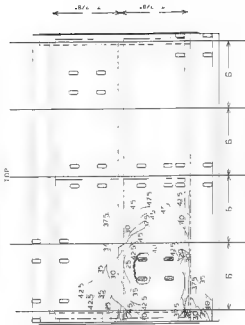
Top Cracking Pattern (Third Bridge - Test No 7)
